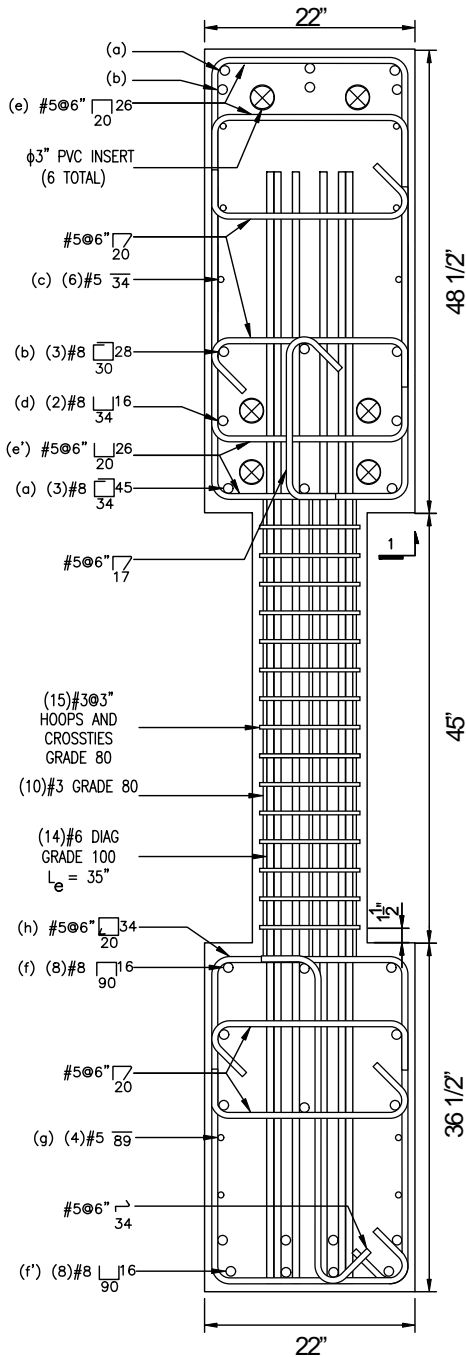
Elevation view of D100-2.5 (1 in. = 25.4 mm)
